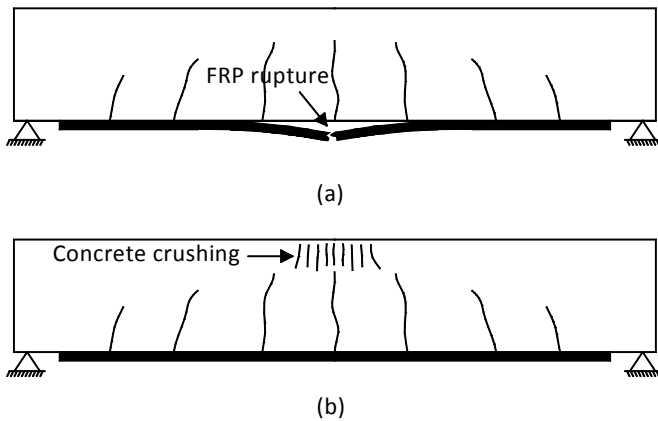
Flexural failure due to (a) FRP rupture and (b) concrete crushing
